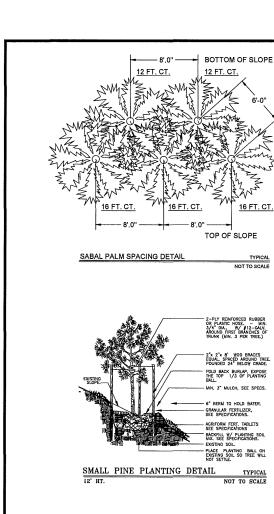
EXHIBIT "B" LANDSCAPE PLANS AND SPECIFICATIONS
